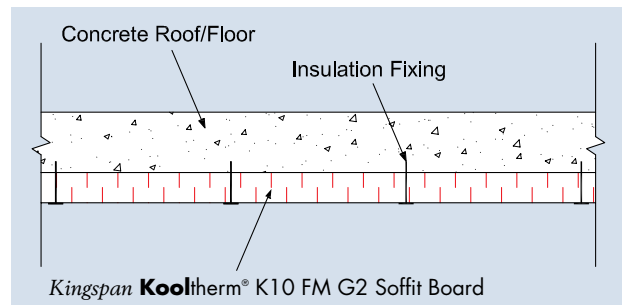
Side elevation - Concrete Soffit with Kingspan Kooltherm® K10 FM G2 Soffit Board
